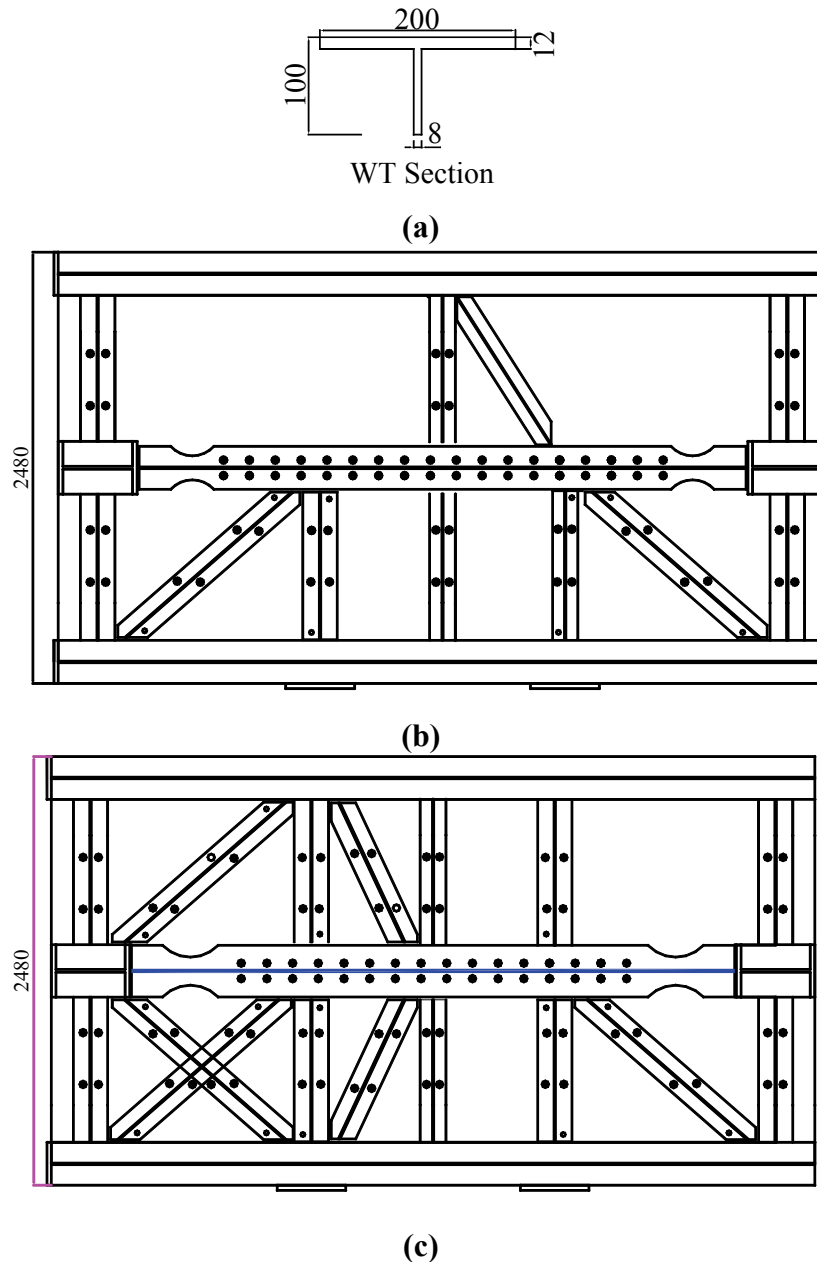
Ancillary Trusses (a) WT Section (b) 1st Floor (c) 2nd Floor
